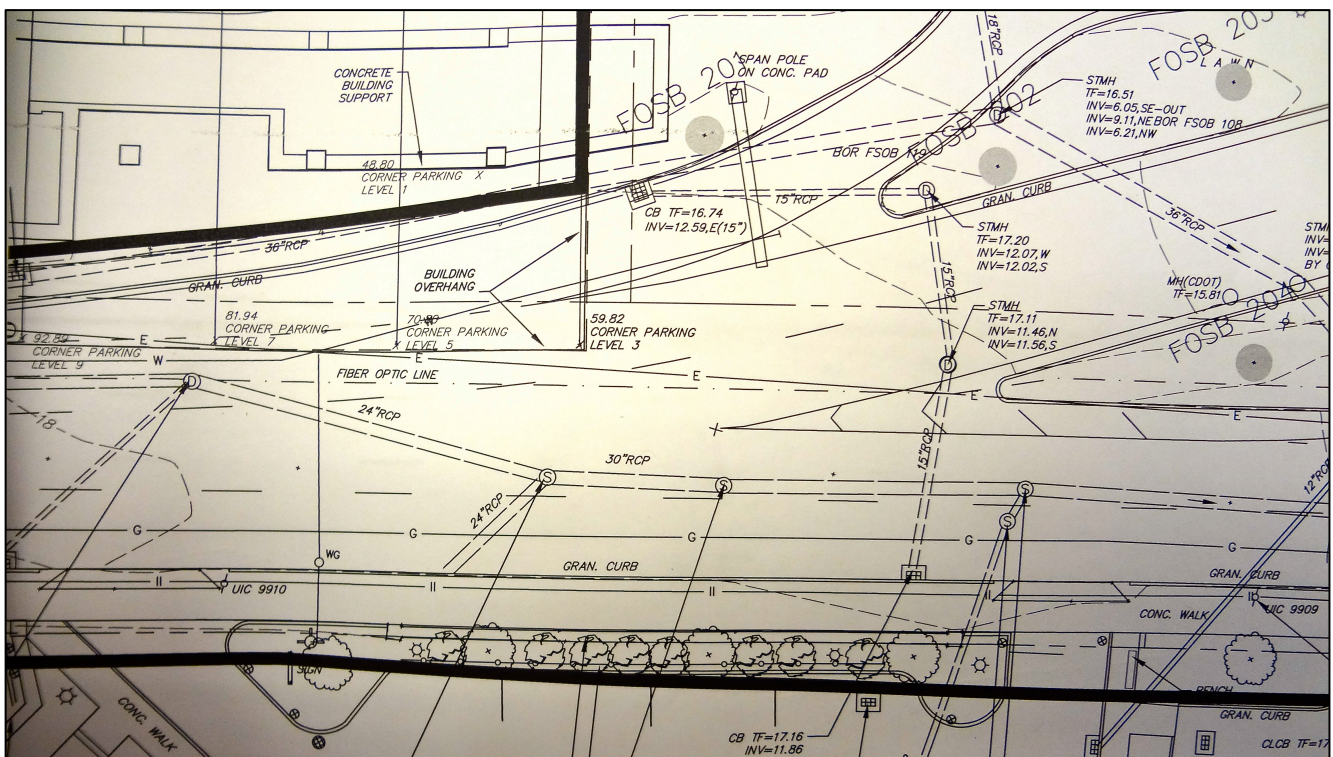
A section of the 100 College Street – Existing Conditions Plan prepared by Fuss & O'Neill. Drawing Number EXC-101.
